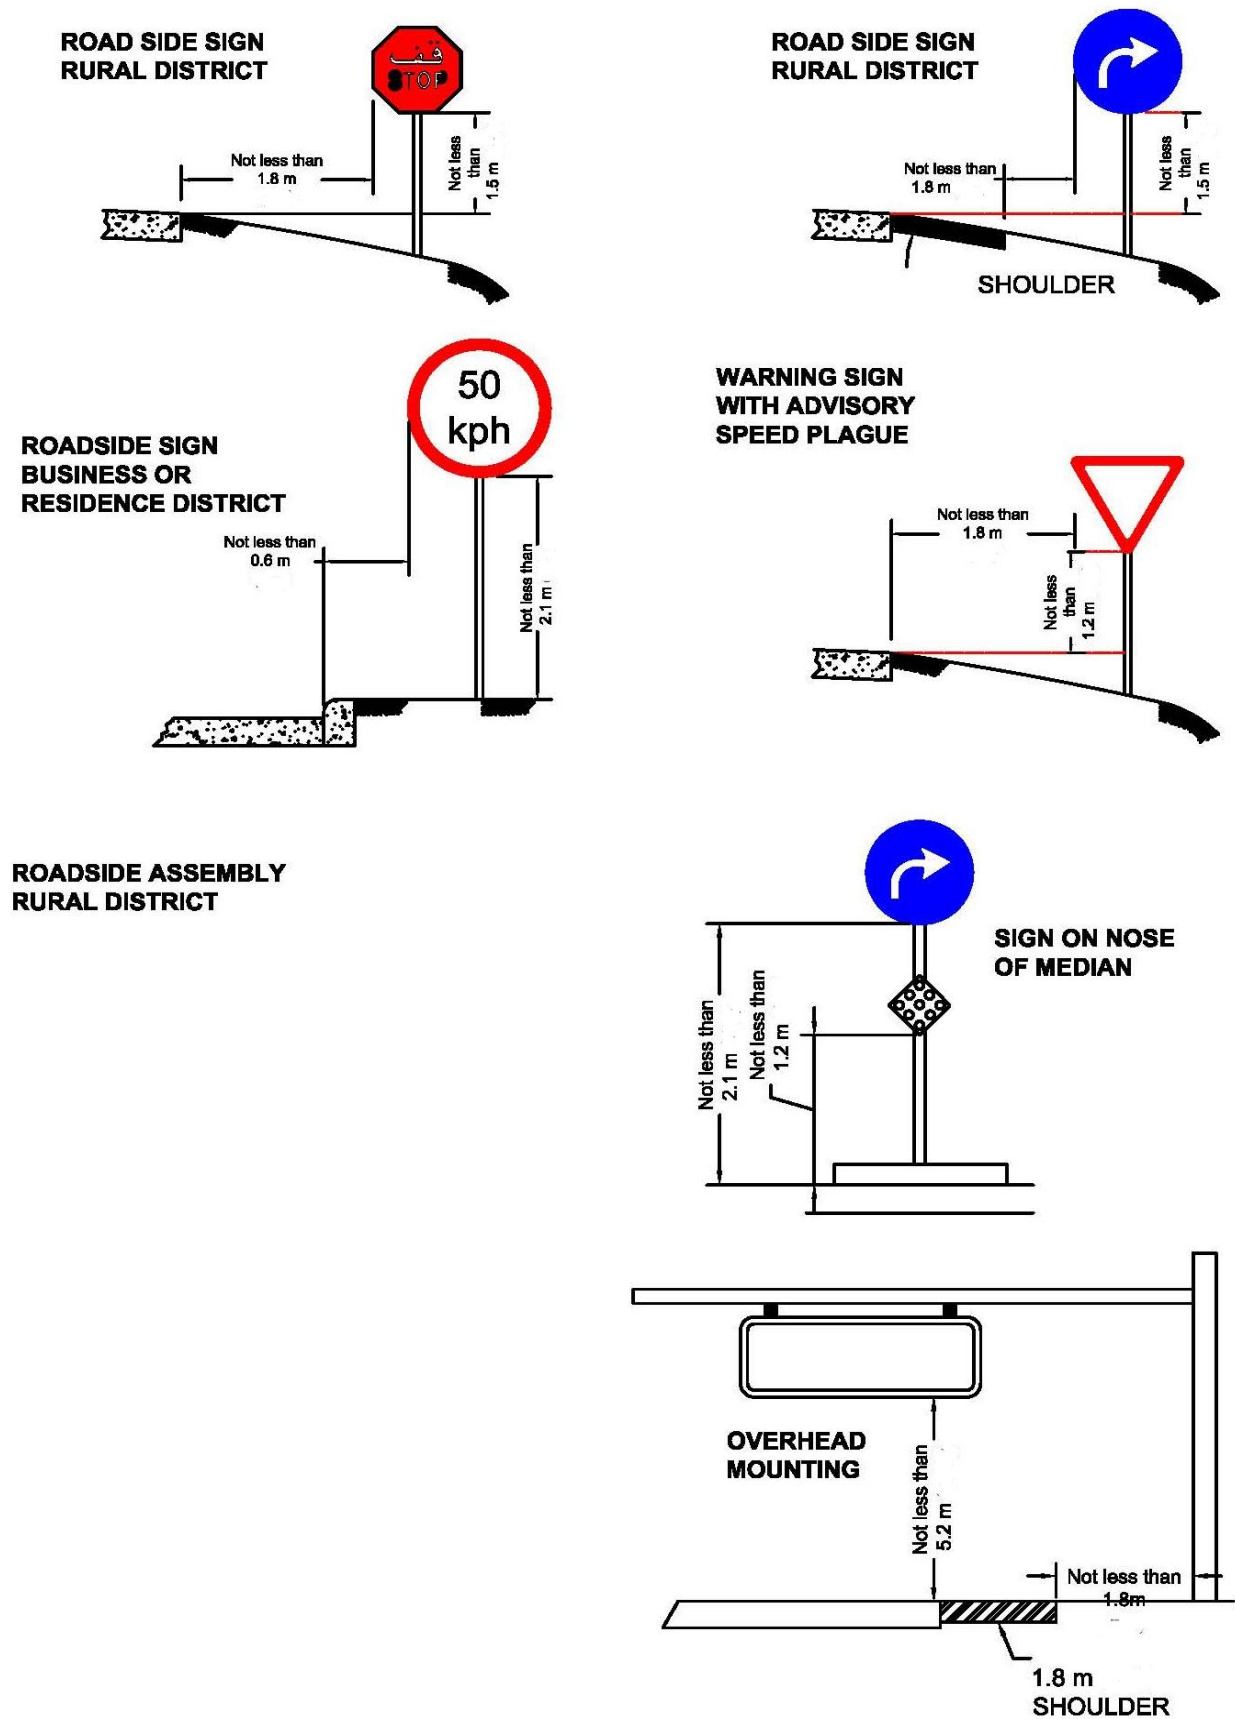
/2: Examples of Heights and Lateral Locations of Sign Installations [1, p.38]
